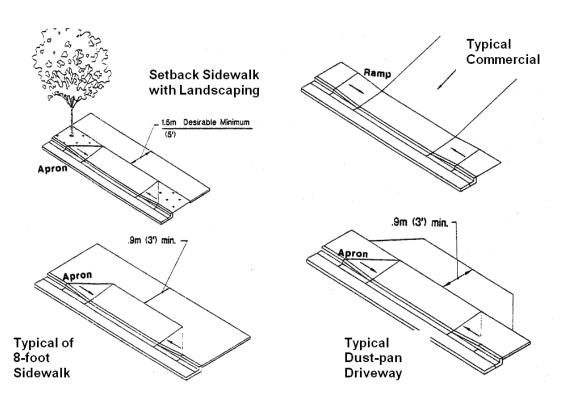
(2): Examples of Driveway Next to Sidewalks/Walkways
